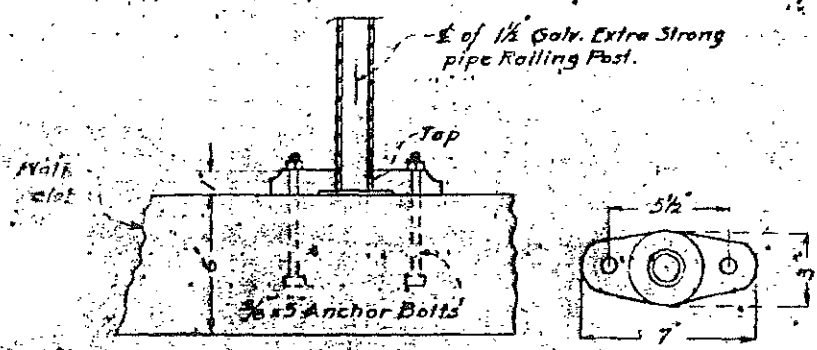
DETAIL CENTER WALL Scale: 1/2" = 1'-0"
